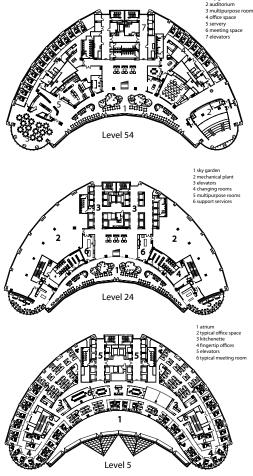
Typical floor plans showing increasing floor plates and decreasing atrium area with height. © Foster + Partners
